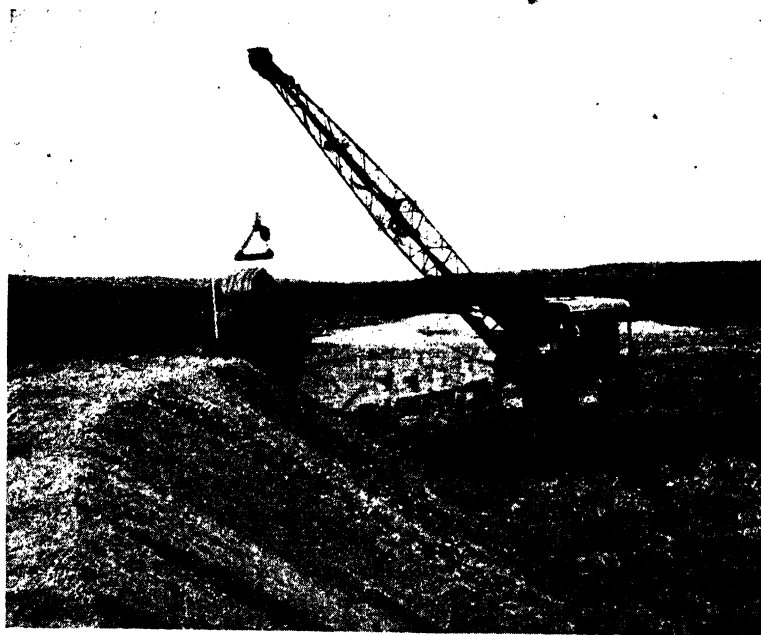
A drag line excavator building a highway fill from a parallel borrow pit.
